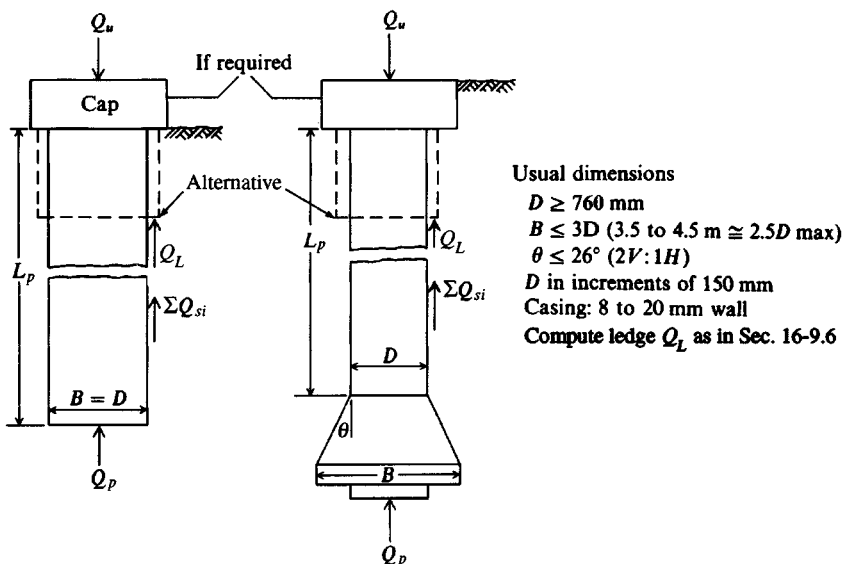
Capacity of straight- or stepped-shaft and belled piers. Commonly used dimensions are shown, but other dimensions can also be used.
